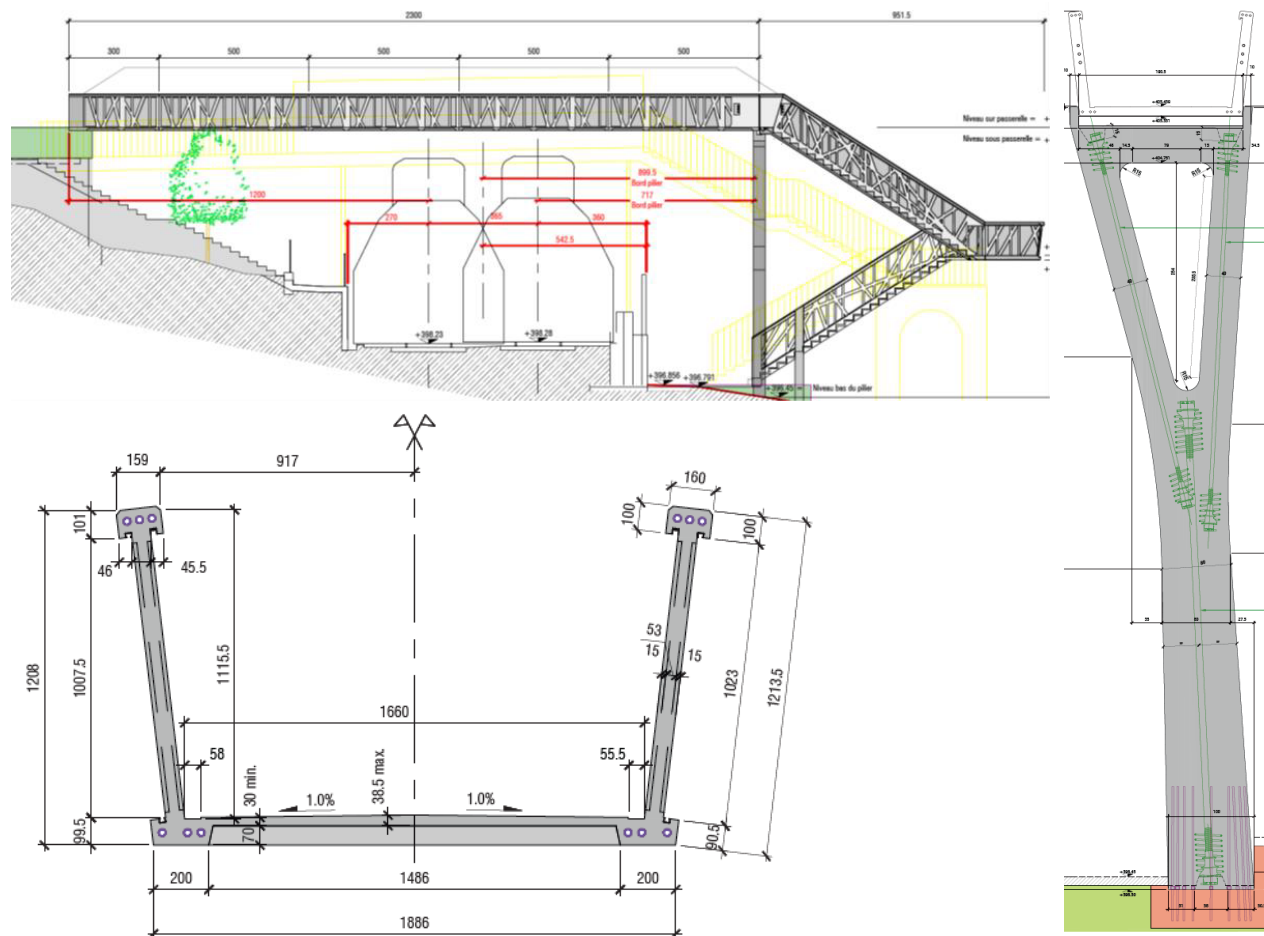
Chaumény Footbridge: Elevation, cross section and pier (dimensions in mm).
